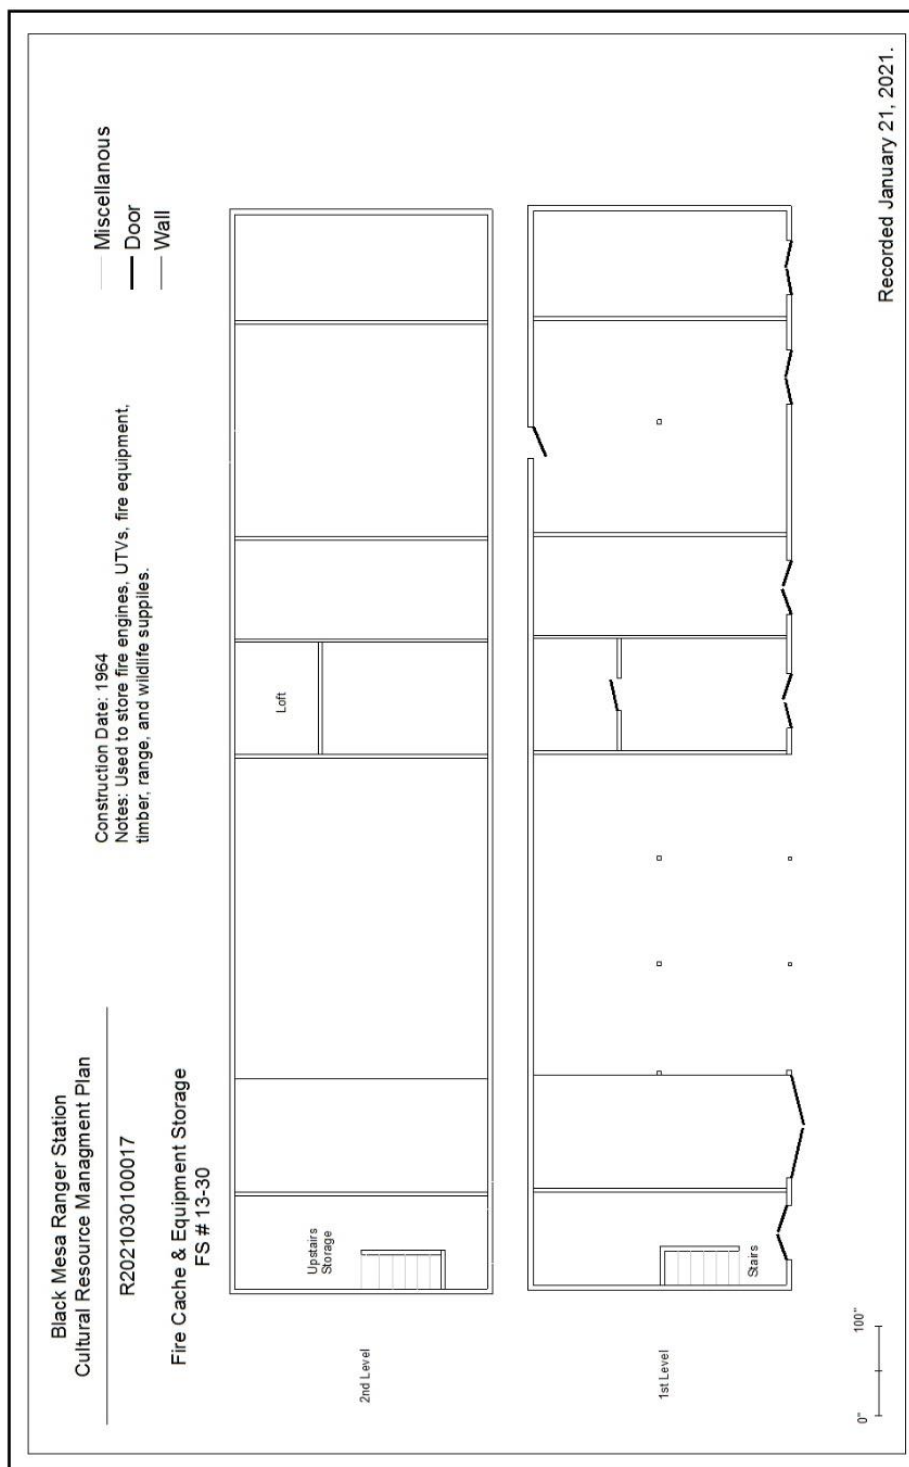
Fire Cache & Equipment Storage floor plan (13-30).
